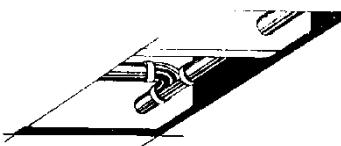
8.5. Pipe run in connection with joists.
